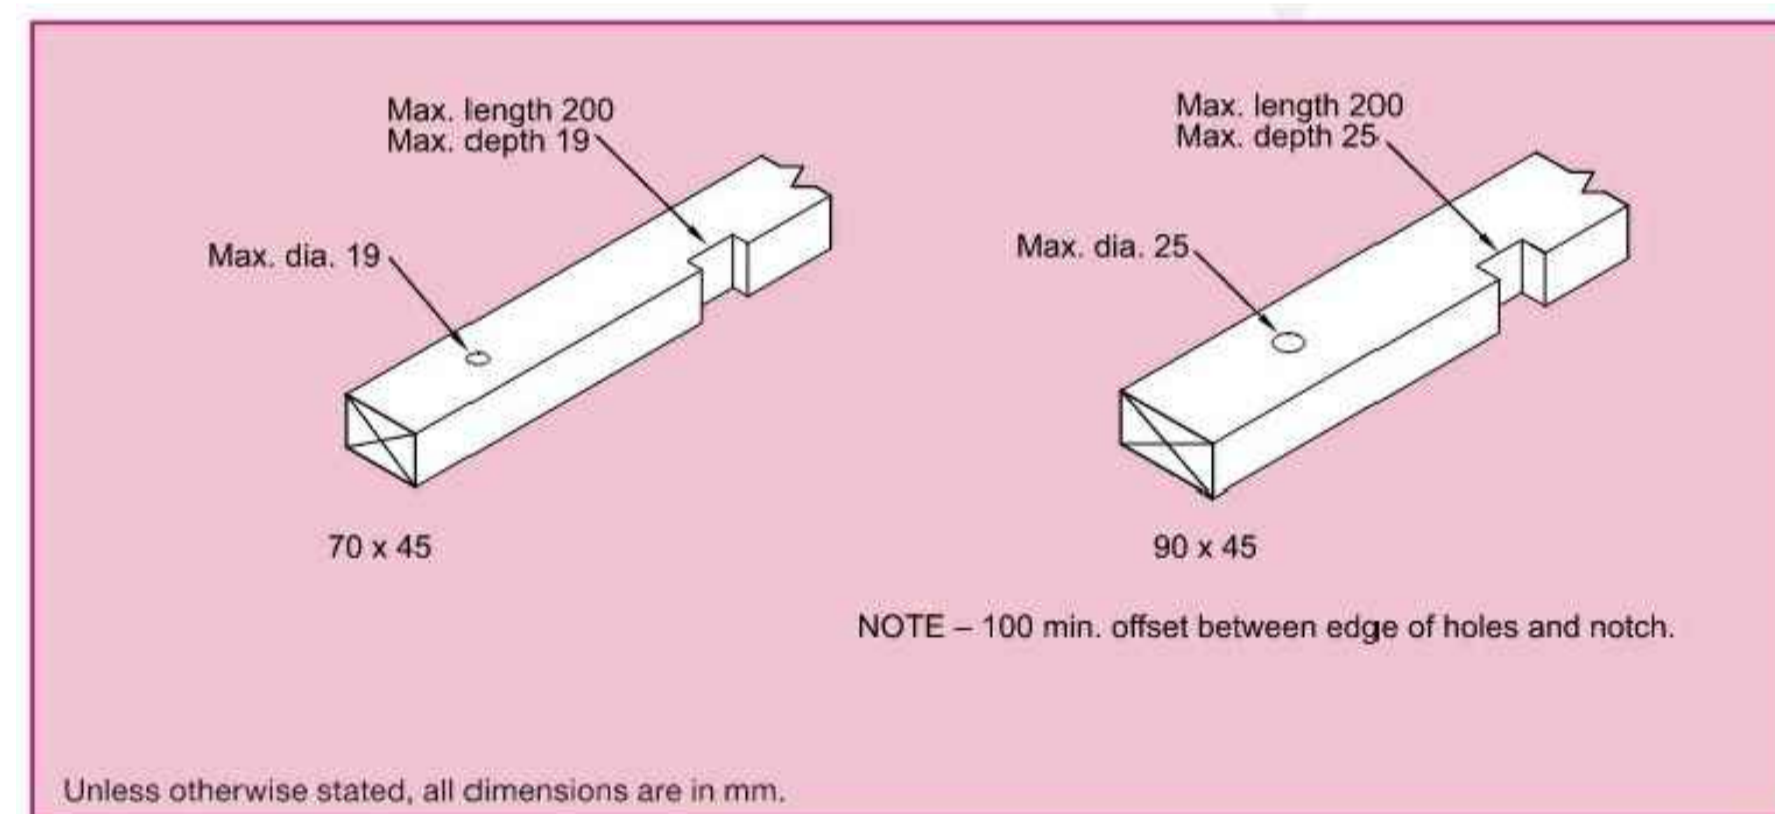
Checking and boring top plates (see 8.7.5.1)
